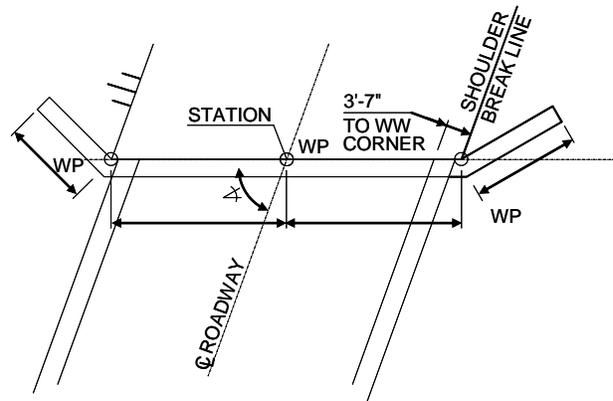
Concrete Slab, Two Cell Box or Two Cell Frame
